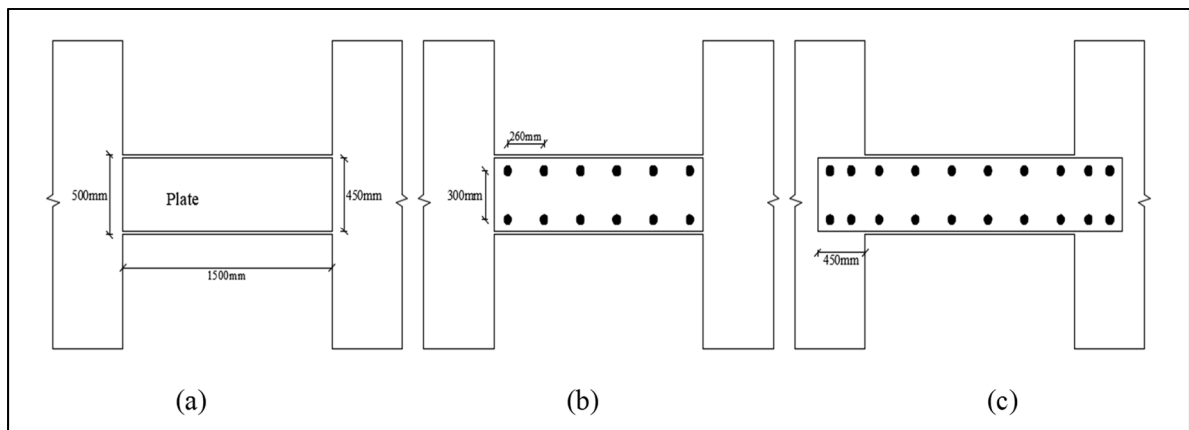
Methods of attaching steel plate to CBs: a) epoxyed steel plate, b) epoxyed and bolted steel plate, c) steel plate extended to walls (adapted from Harries, 1995)
